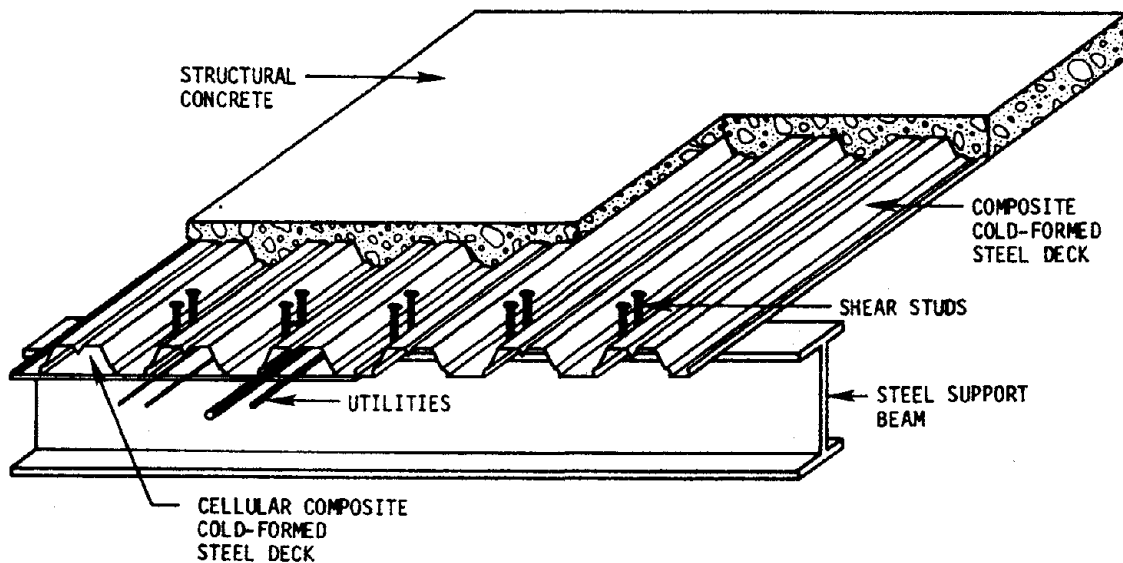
Typical construction utilizing cold-formed steel decking with composite support beams.
